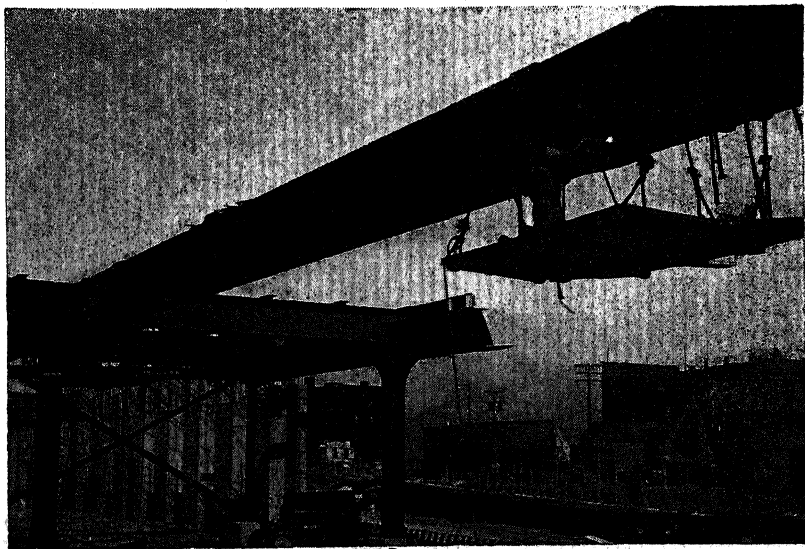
One of two 122-ft. all welded over-pass spans for Main Avenue bridge, Cleveland, Ohio. One girder is shown in place and welders are working on the double V groove web joint.
